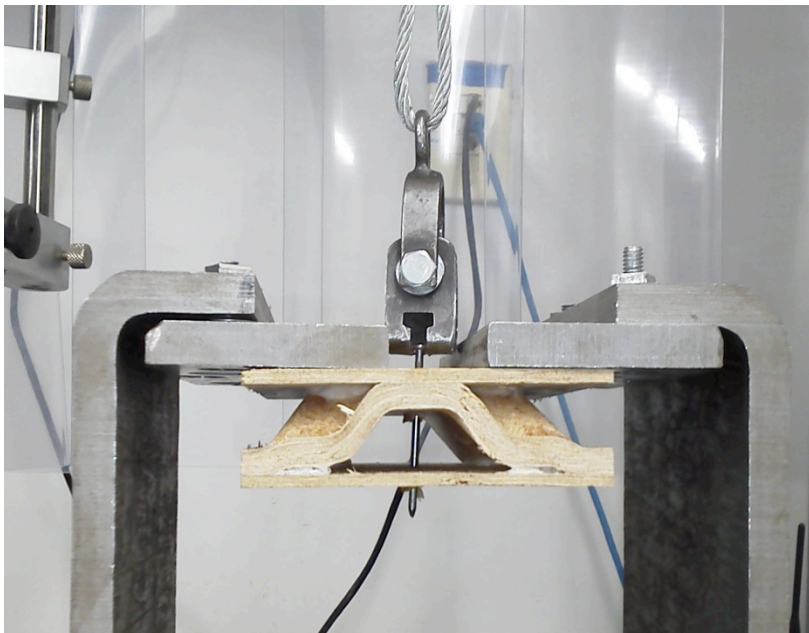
Dowel bearing test on thick side of panel only with 3.3 mm dowel
